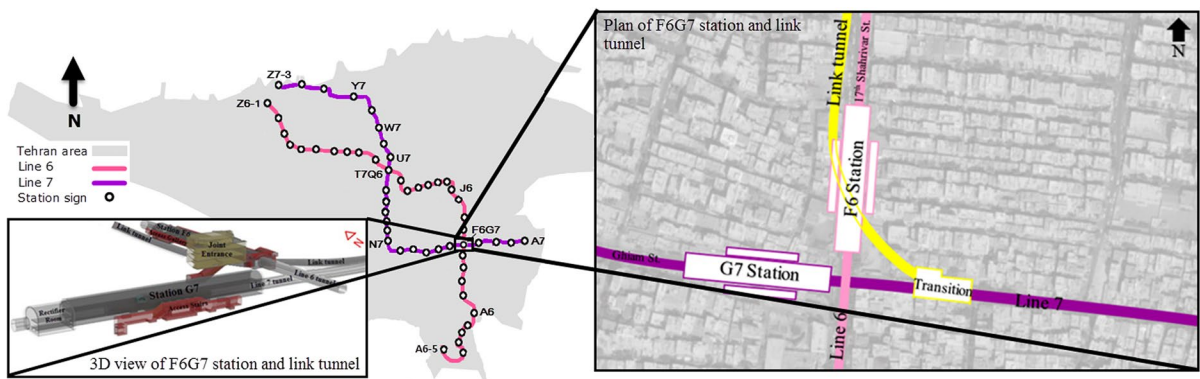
Plan of line 6 and 7 of Tehran metro, F6G7 exchange subway station and link tunnel plan and 3D view
